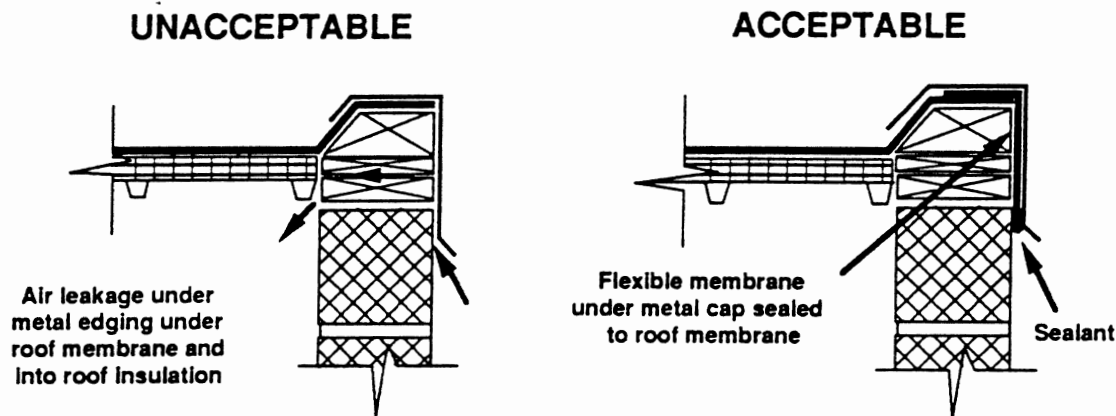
Air Leakage at Roof Edge (Riedel)
